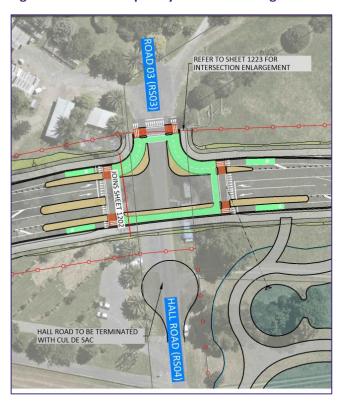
Future arrangement at Whatukooruru Drive/ Hall Road
